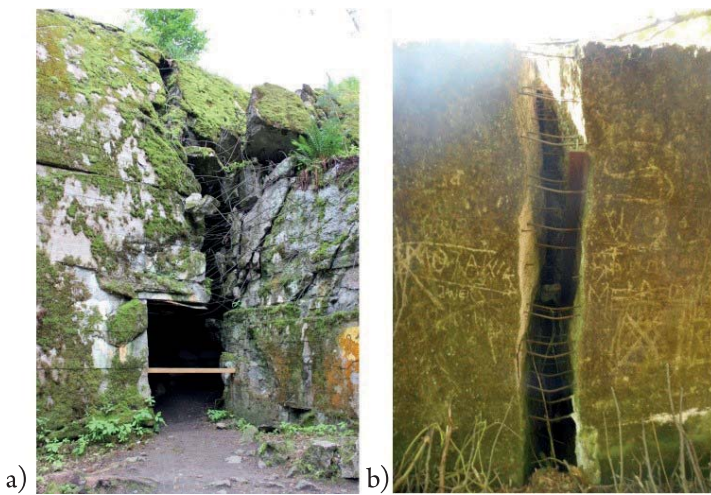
View of the importance of reinforcement in ensuring ductility and compactness of concrete structures (own photos)
